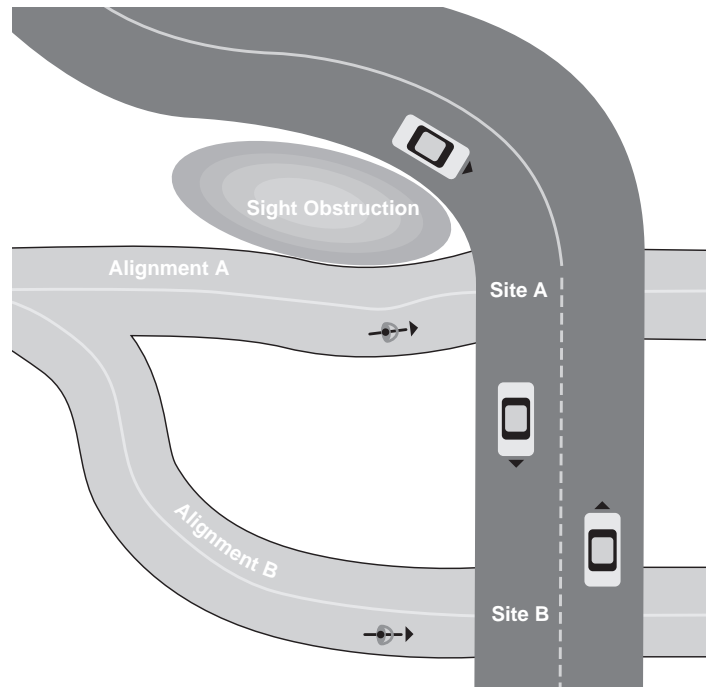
Proper path alignment can help eliminate sight obstructions. Alignment “B,” for example, gives a better crossing location than does alignment “A.”
